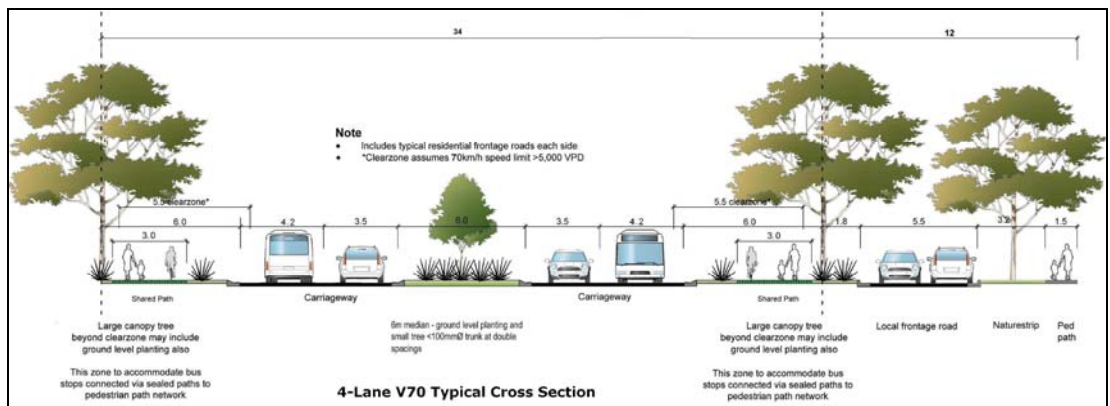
Ballarto Road 34m Four Lane Arterial Cross Section
